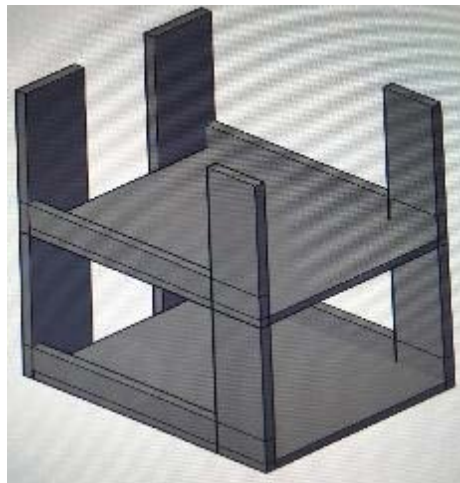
AutoCAD drawing of the Skeleton. (Robert Carey)
